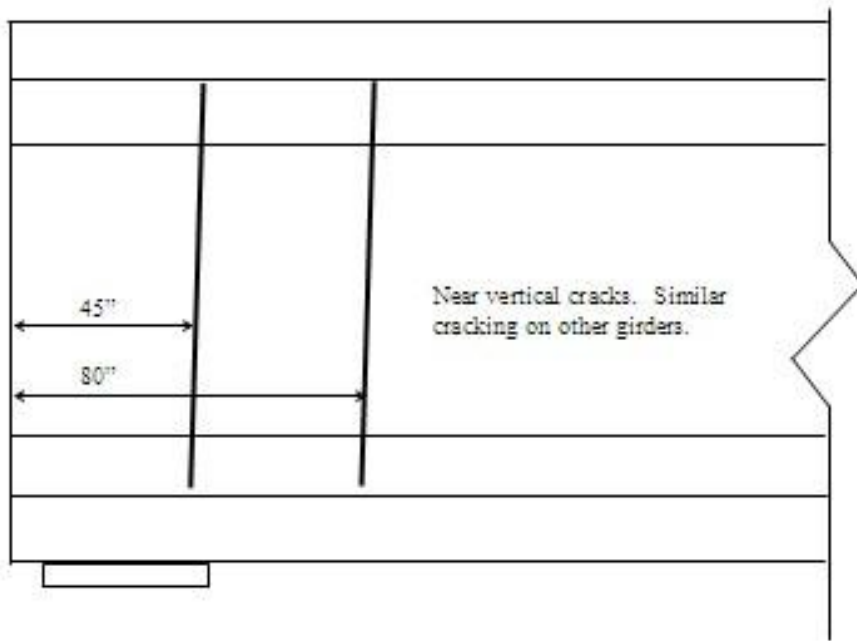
Crack diagram for girder 2nd from south side, south face, west abutment (#12773).
